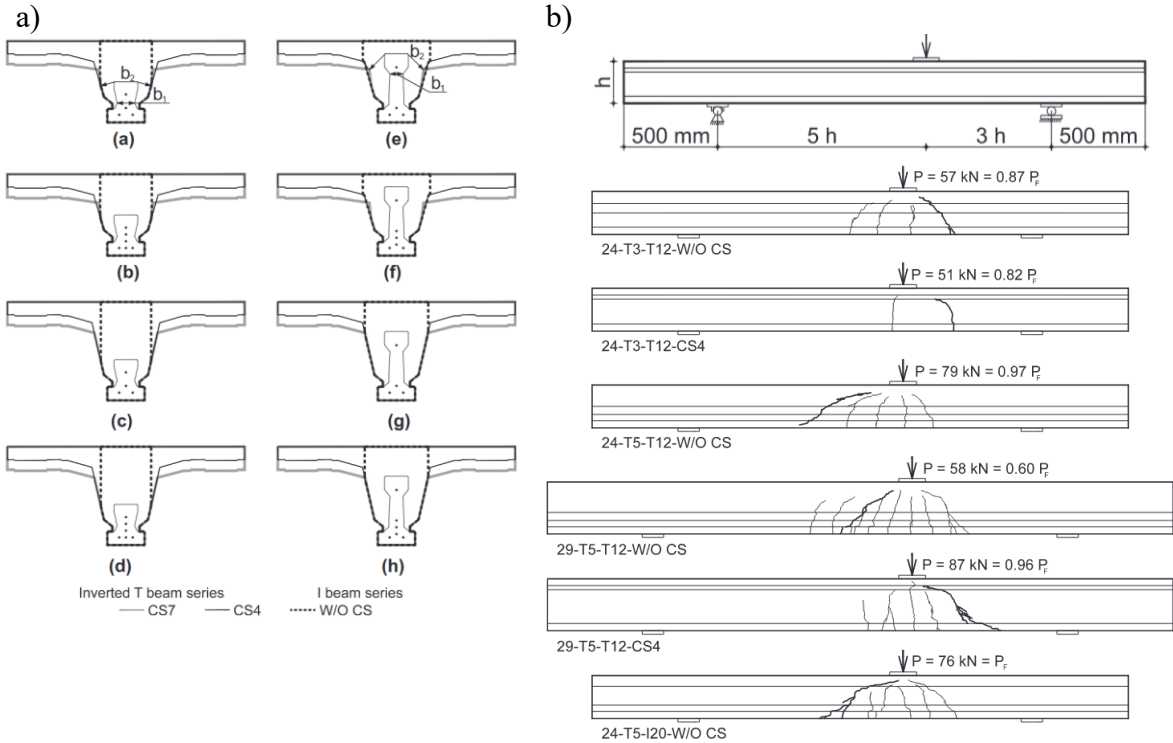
Research of Ribas and Cladera on prestressed slab ribs: a) tested cross-sections, b) crack pattern of shear failure beam [63]
